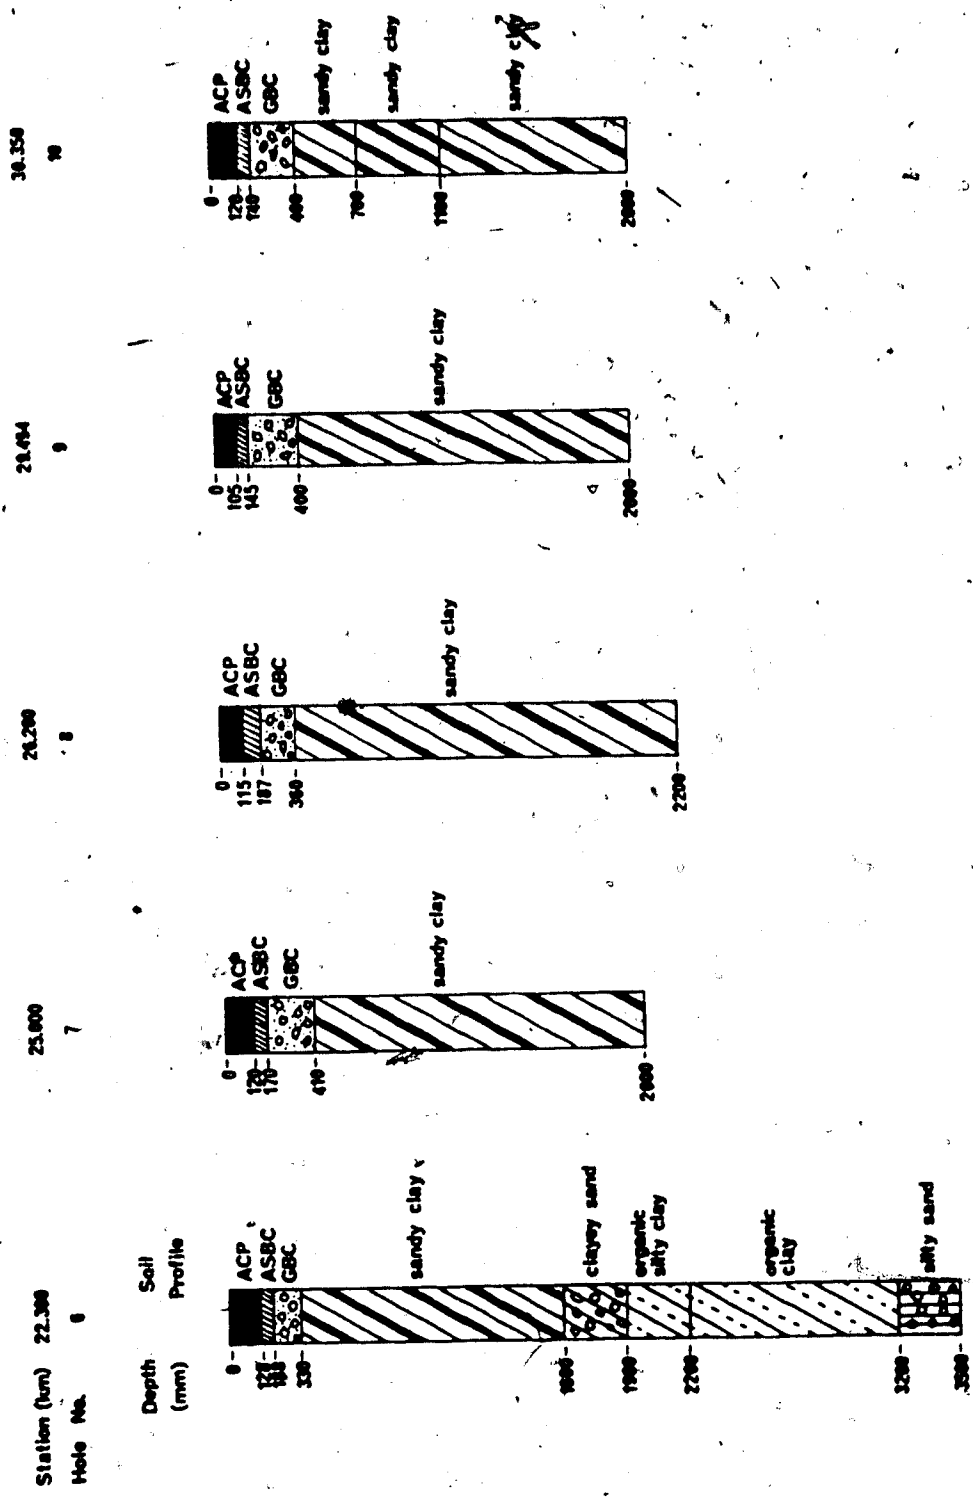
Project 33:10-2 (Non-cracking Section)
